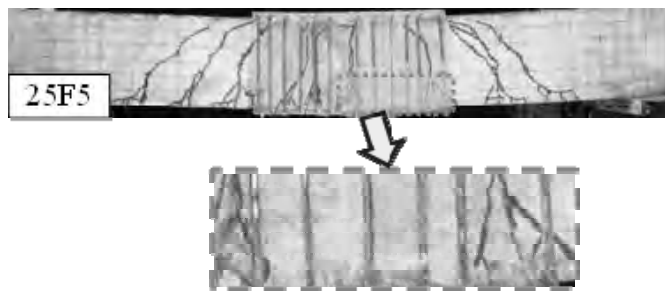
Crack pattern of specimen retrofitted by ferrocement jacket with skeleton steel (observed on main beams)
